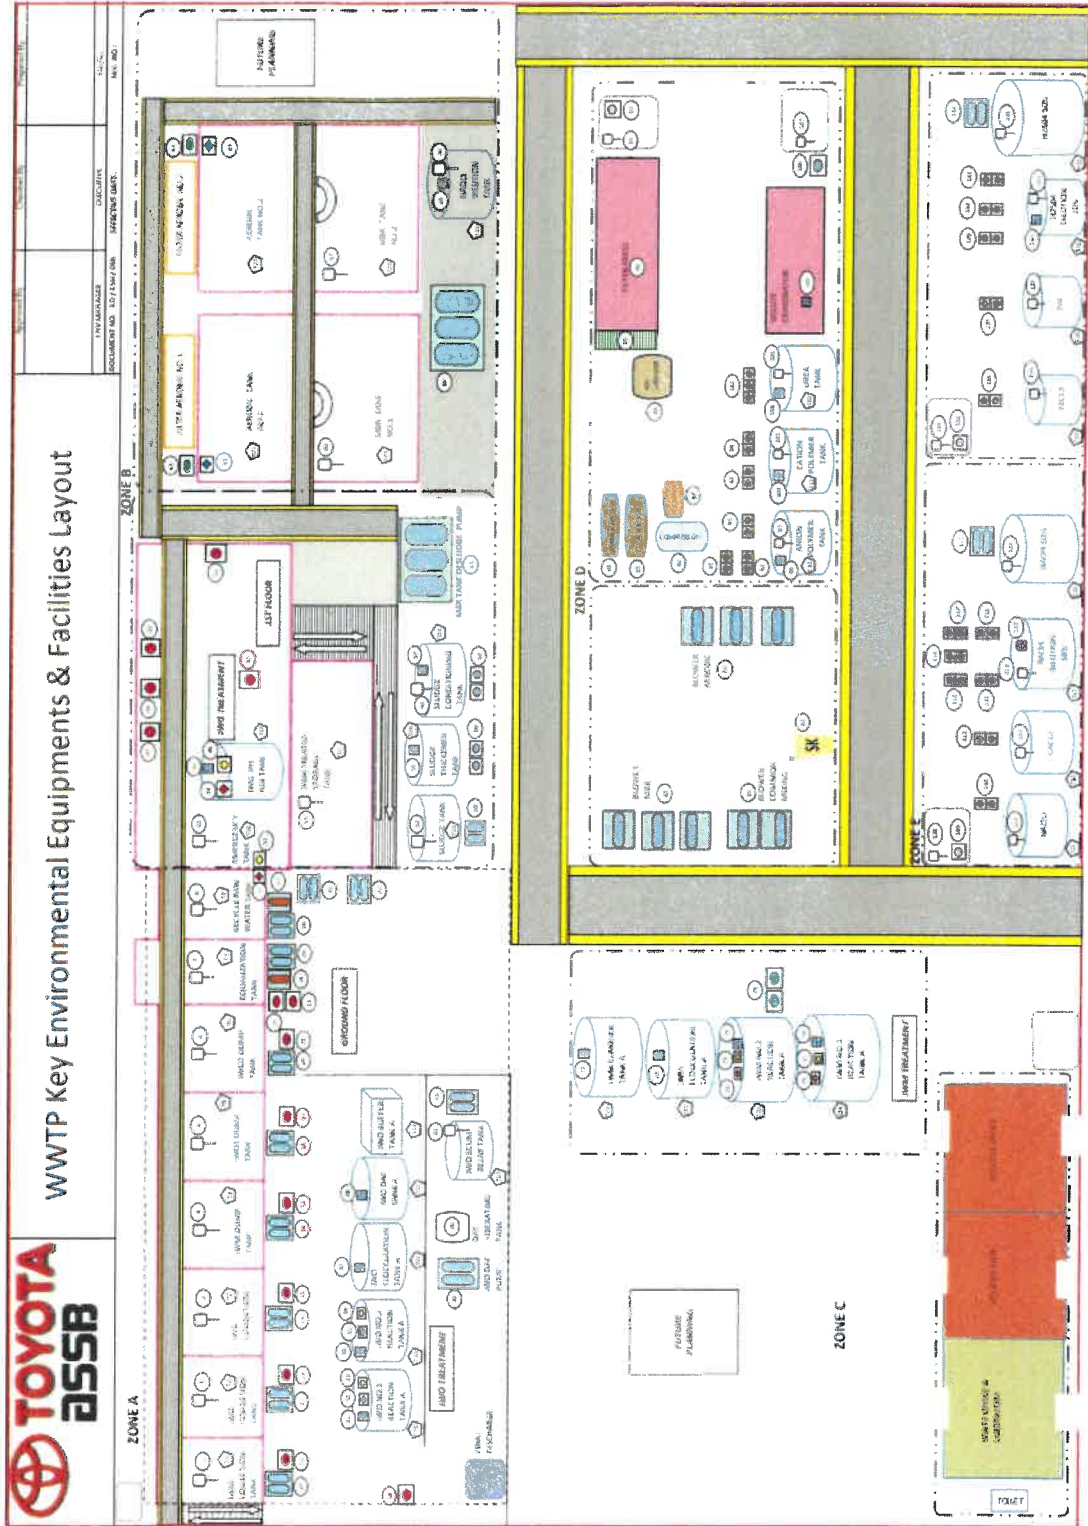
; Plant Layout of WWTP of Bukit Raja Plant
